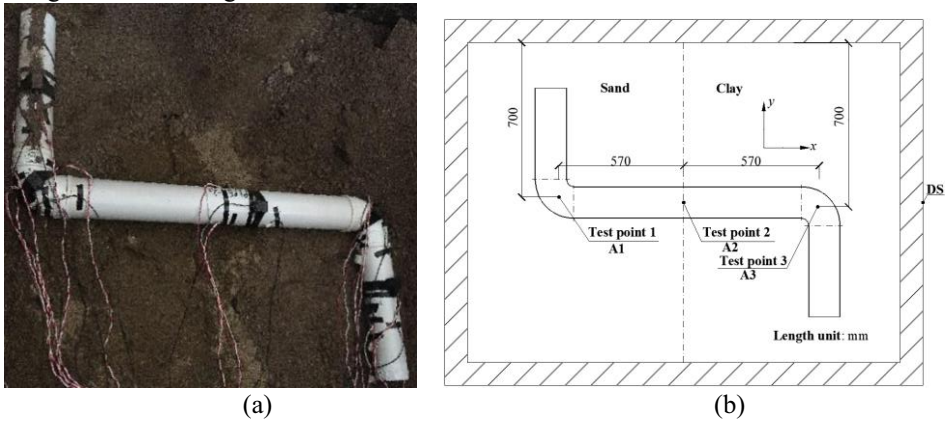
Sensors layout for pipe bend. (a) The sensors layout at pipe bend. (b) The design of sensors layout for pipe bend.
